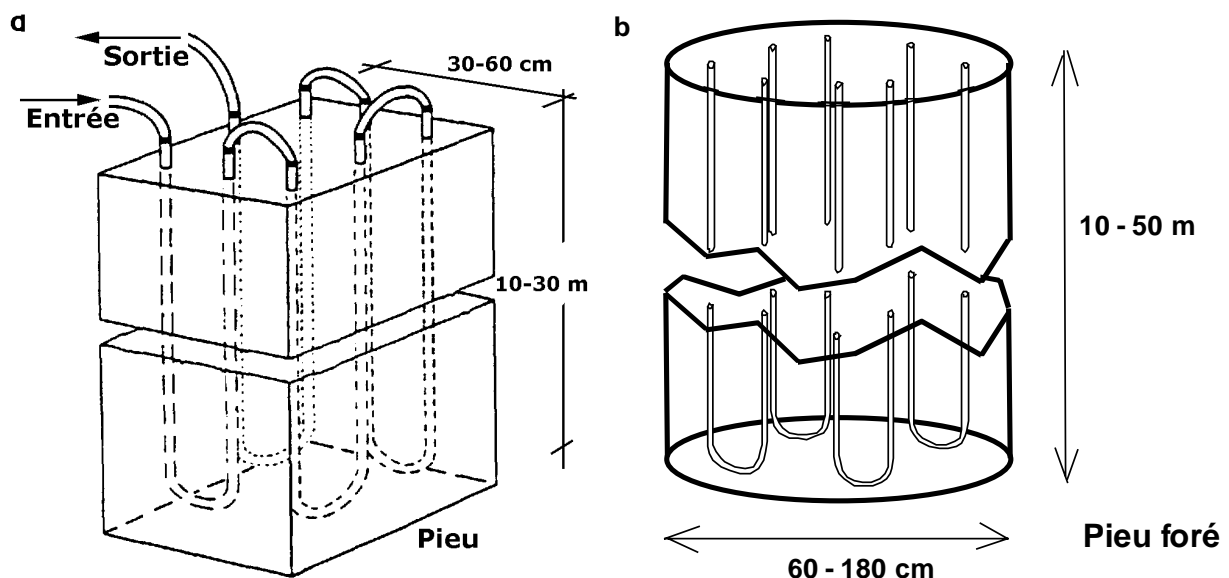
Heat exchanger pile examples ; a) hammered precast pile, b) cast-in-place pile.
